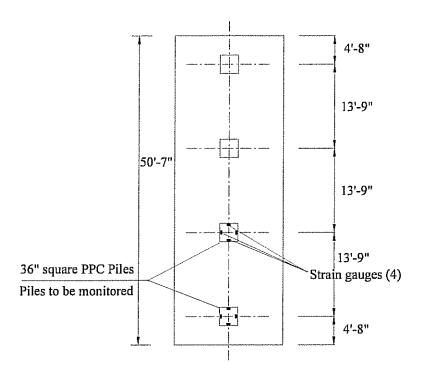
Plan view of piles (Bent 1, LADOTD Design Sheet 109)
